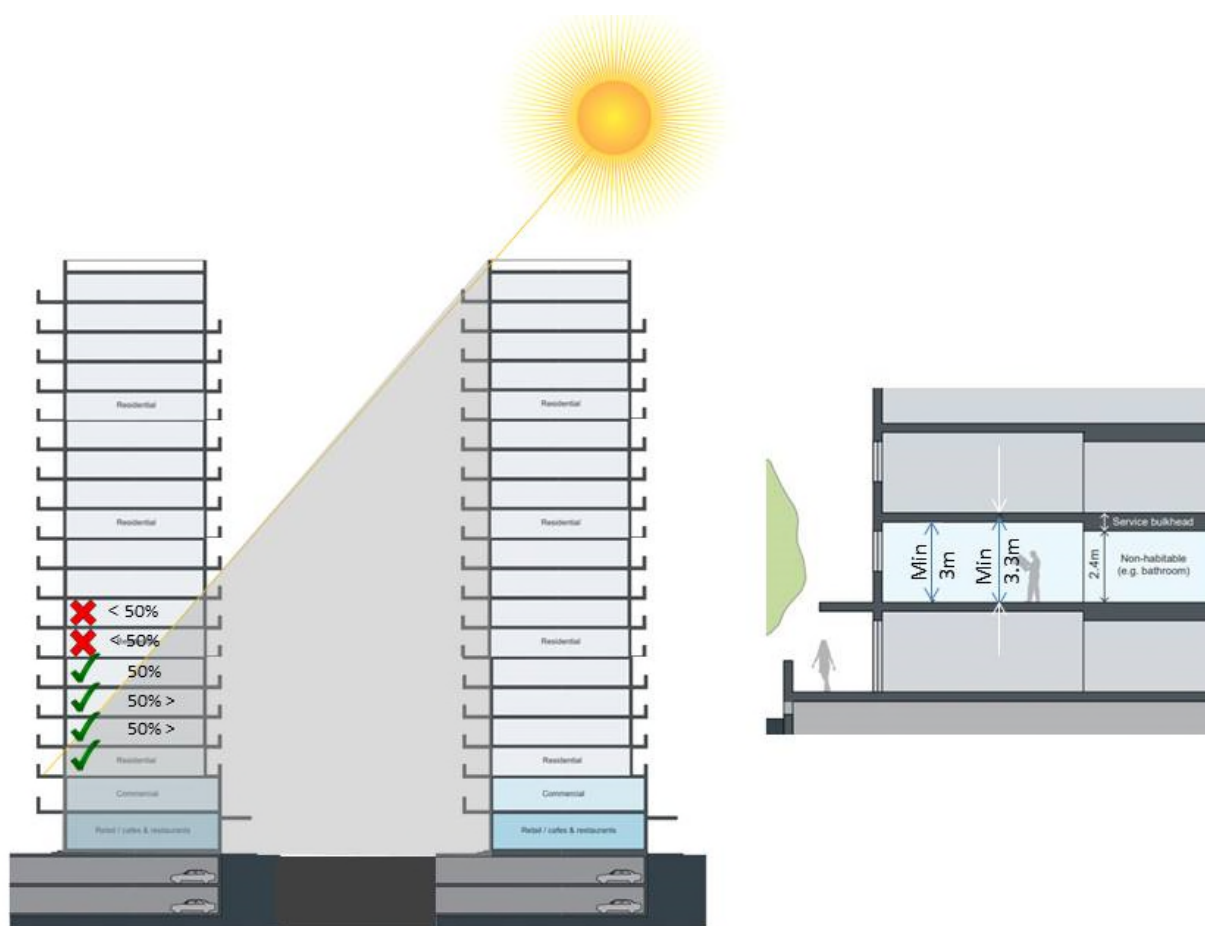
Increased floor to ceiling heights (Adapted from ADG 2015)
